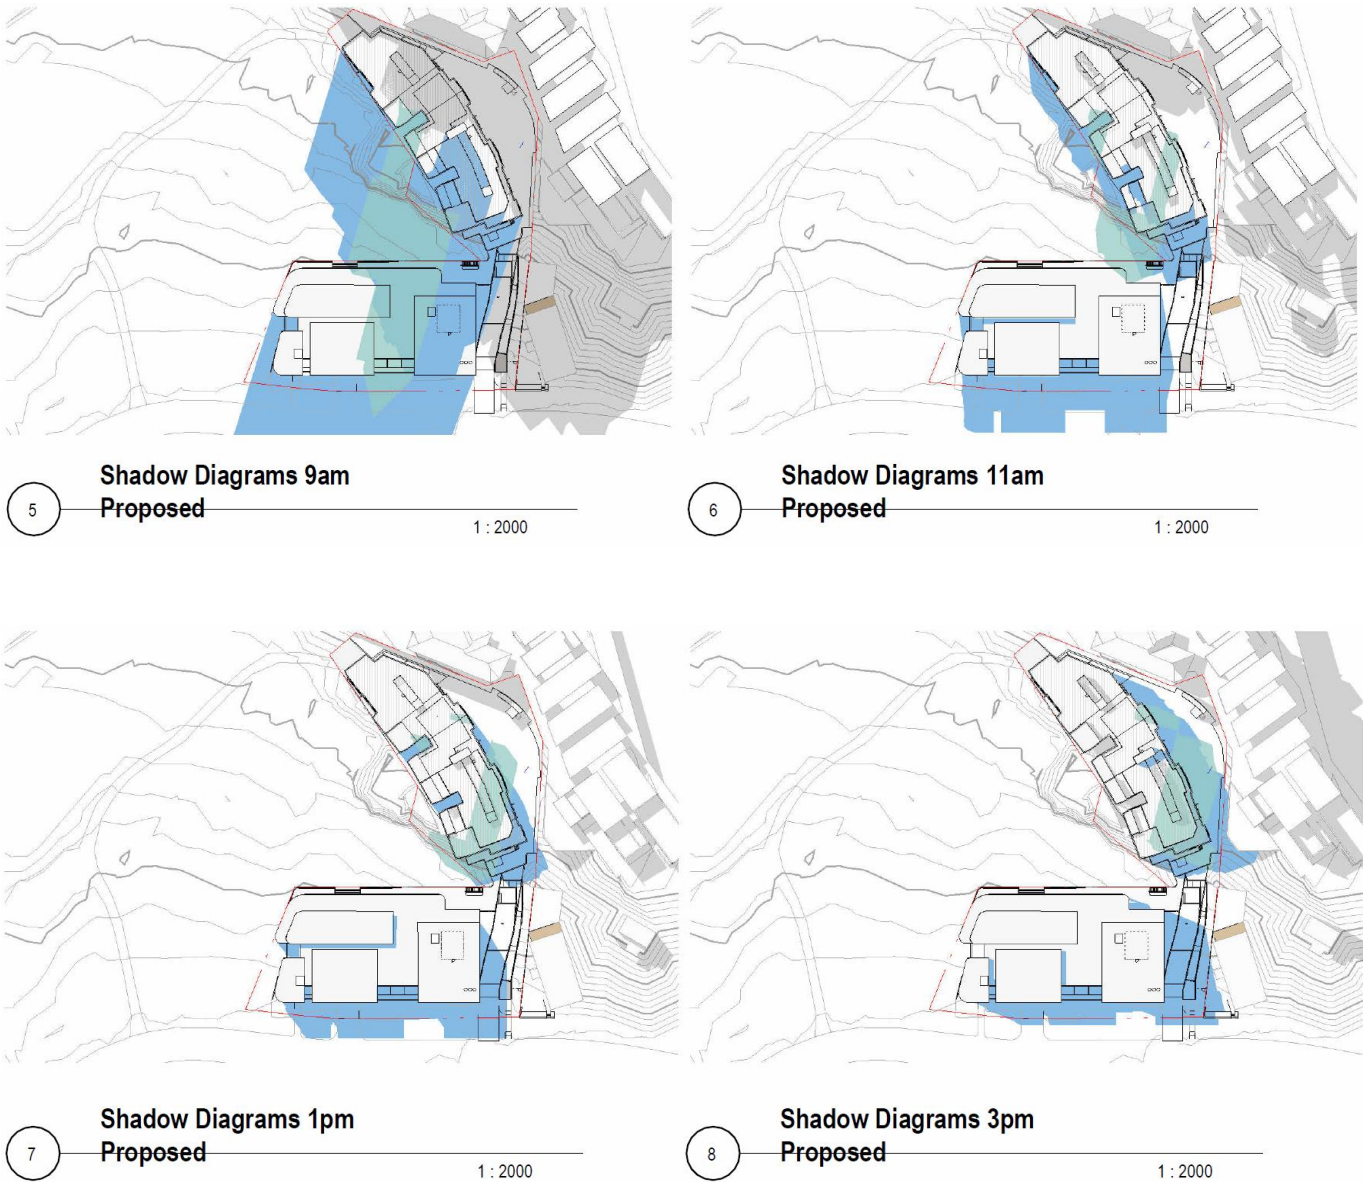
Existing (Green) and proposed (Blue) overshadowing impacts
